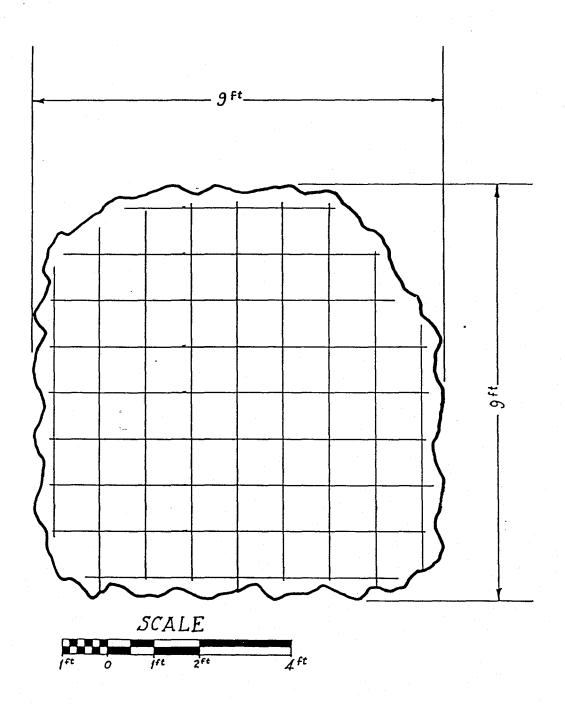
Water-side rebar cage (mat) for temperature and shrinkage control in the B-Level Brenneman/Sunnyside Connection, #6 bars, 12-in. spacing, 3-in. minimum depth of cover.
